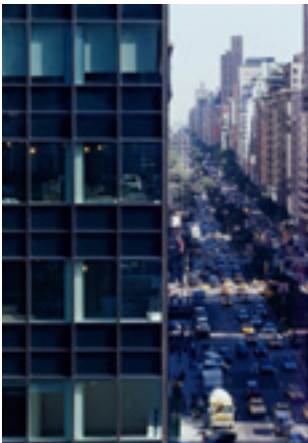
The new curtain walling of Lever House, photographed 2013
